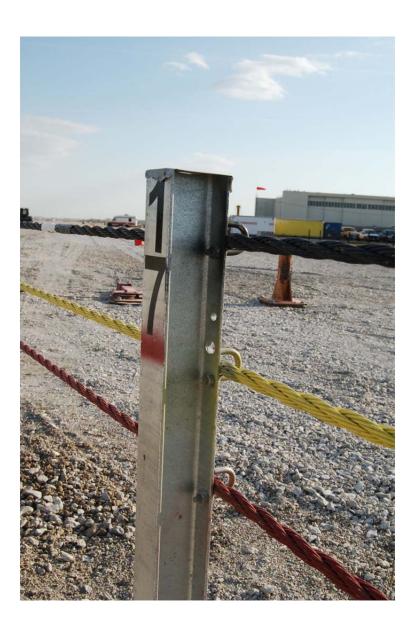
End Anchorage Photographs, Test No. NYCC-2
